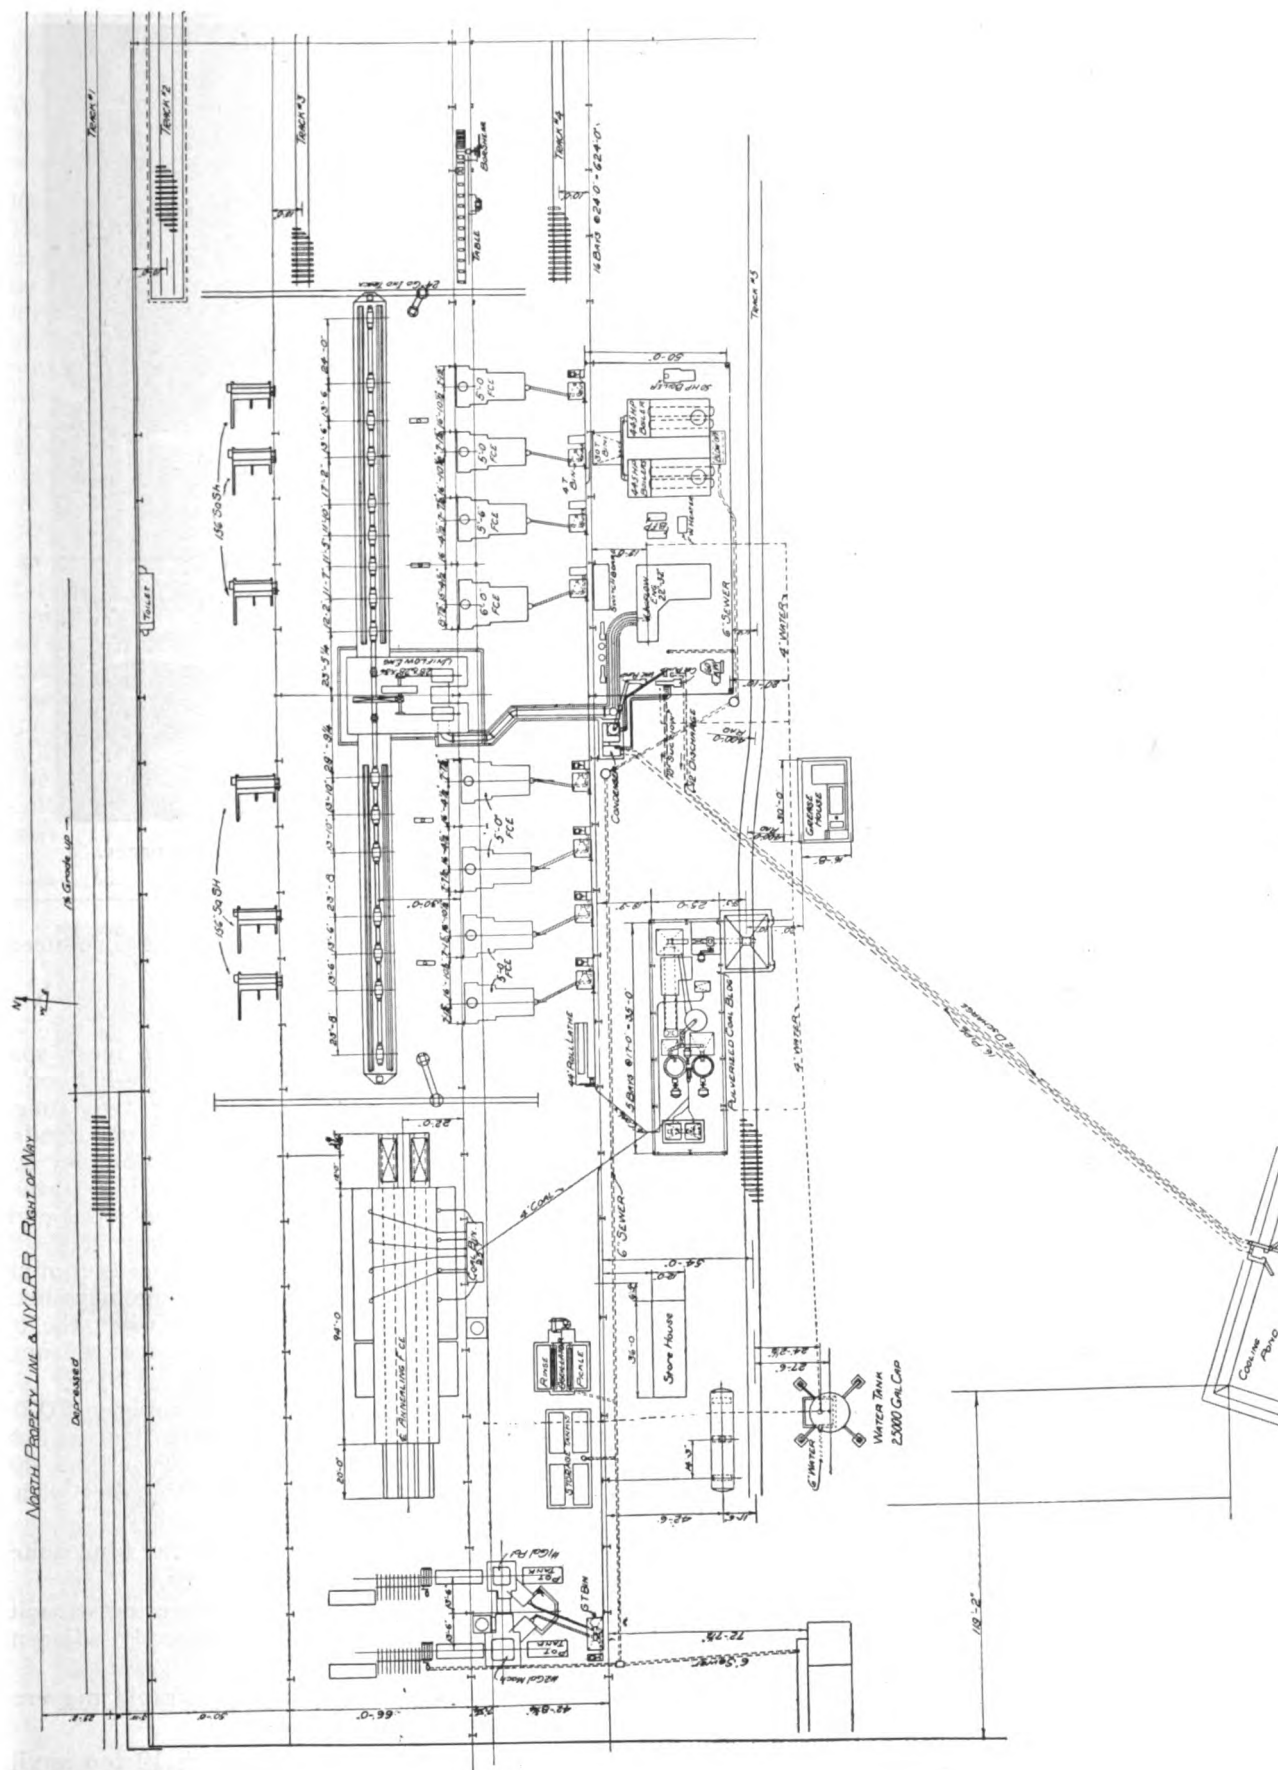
Plan view of the new sheet steel plant at Ashtabula
